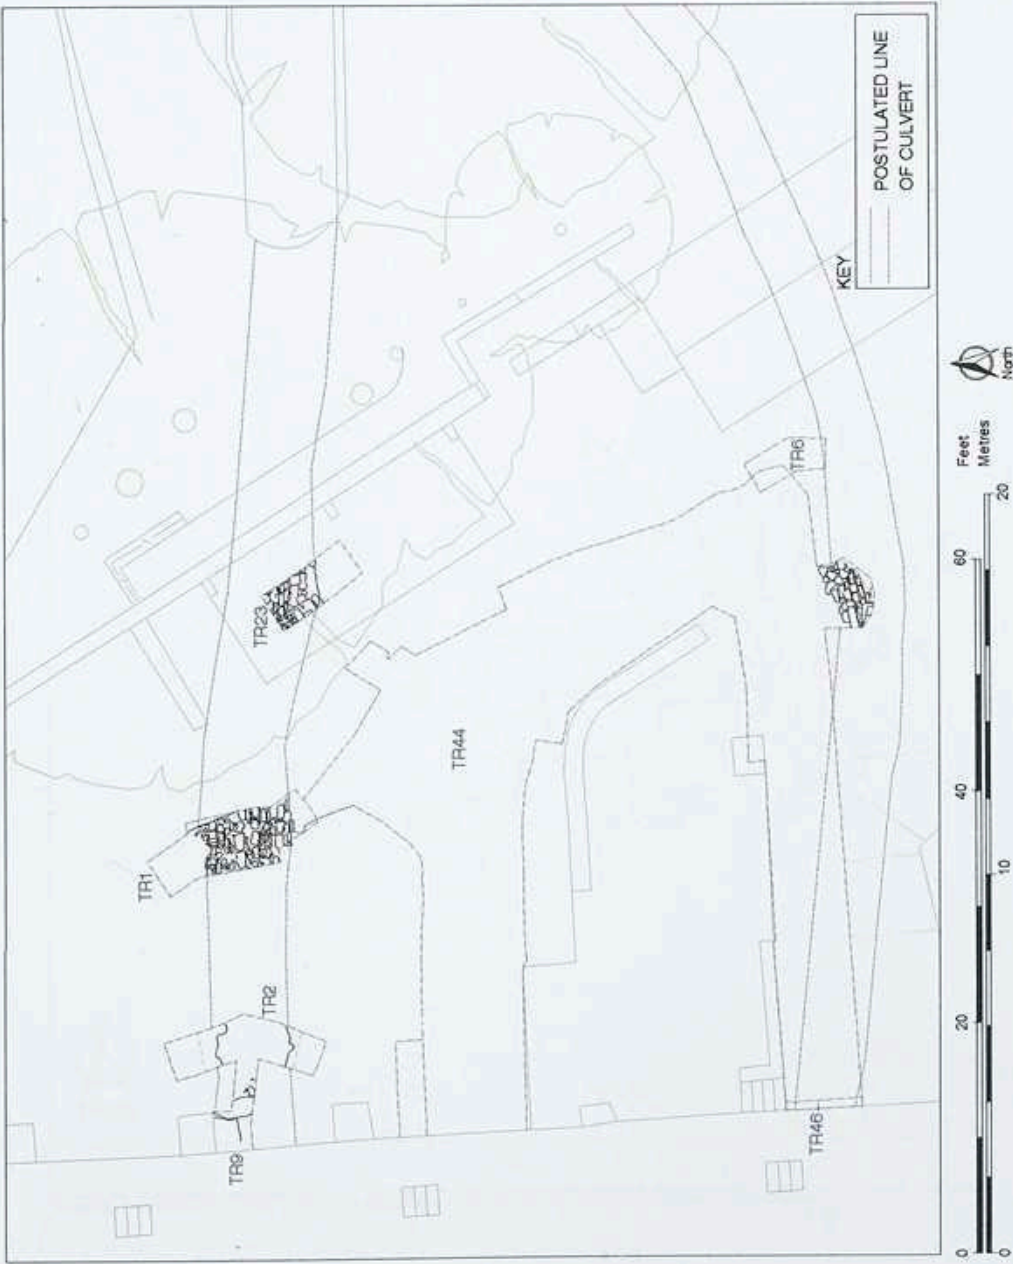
Eastern Mill Yard, plan of north and south culverts. Scale (1:200).
